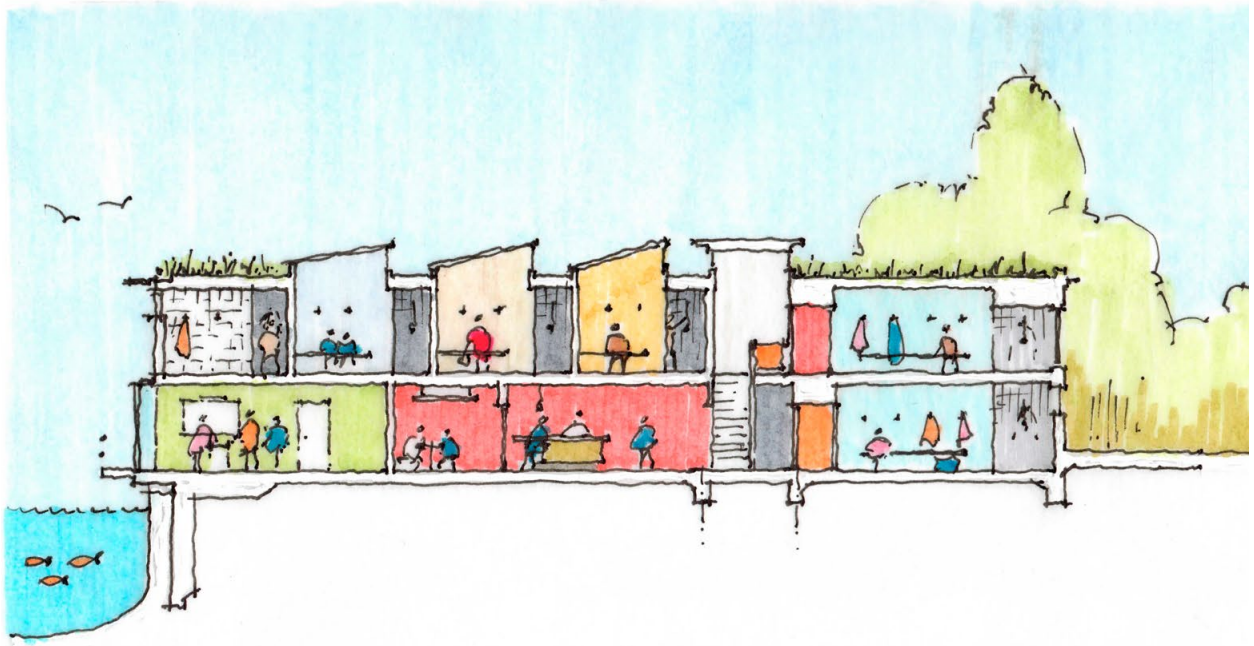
Watersports Centre - Proposed: Sketch section
